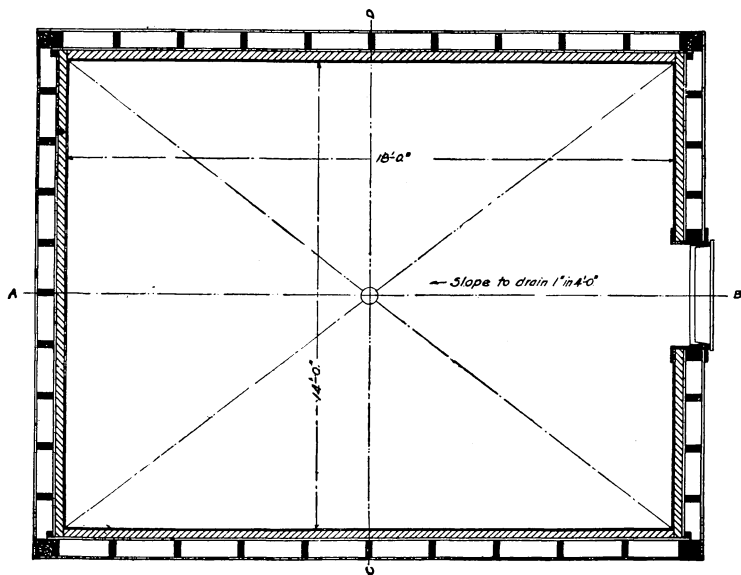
Frame ice house with commercial insulation. The perspective view in figure 19 also illustrates this plan. (Ground plan.)
